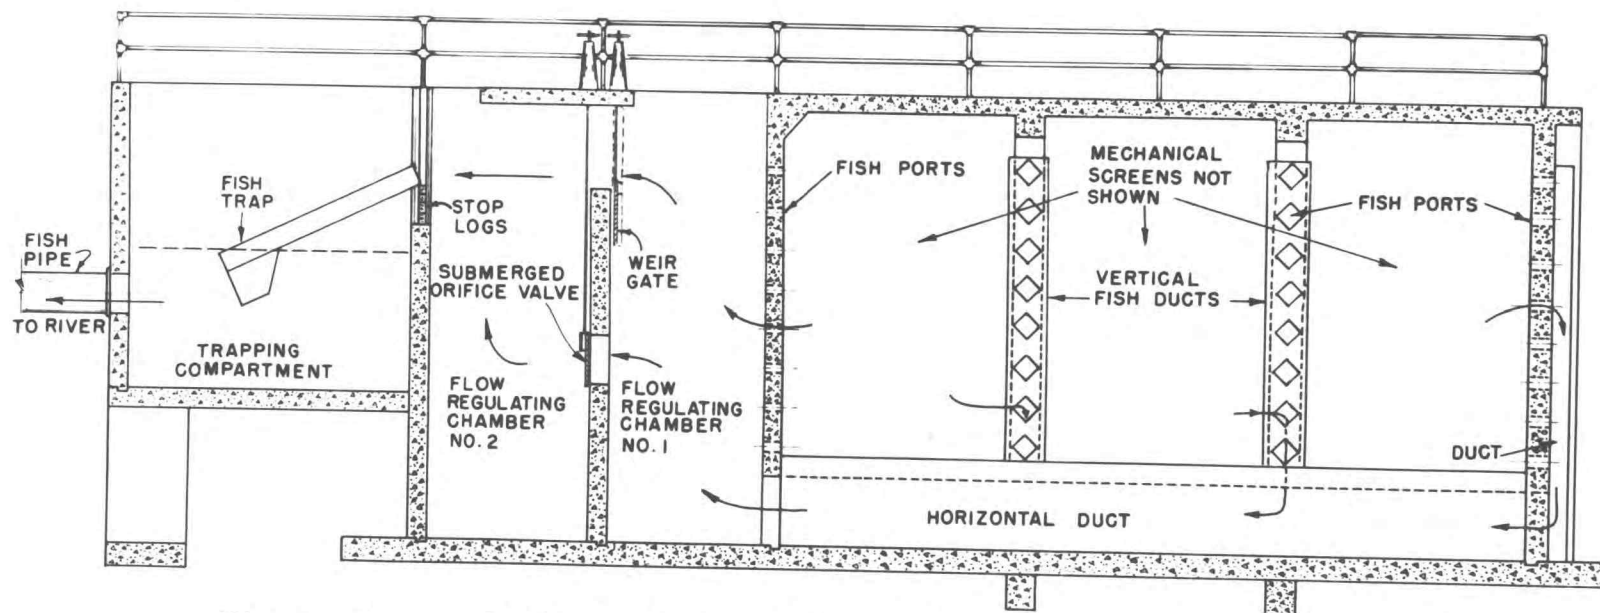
SCHEMATIC SECTION OF FISH BYPASS
